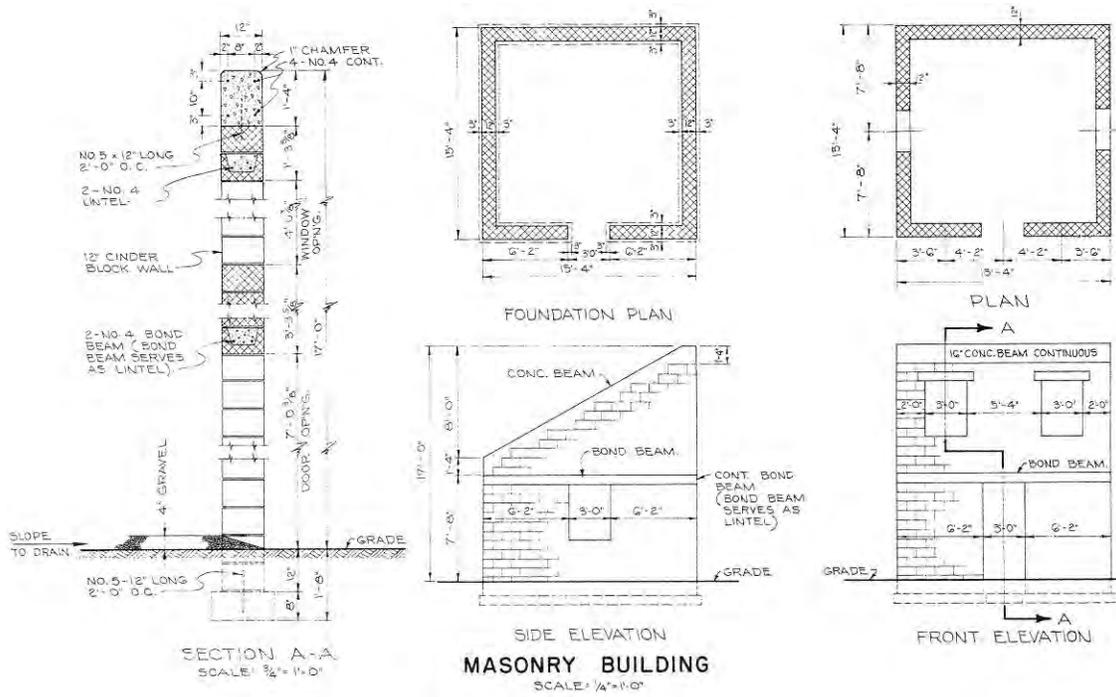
"Combat in cities" course masonry building at Section 1, 1952 (standard drawing 28-13-01 sheet 7 of 9; "Combat in cities" course, structures at Station 1; 20 June 1952).
